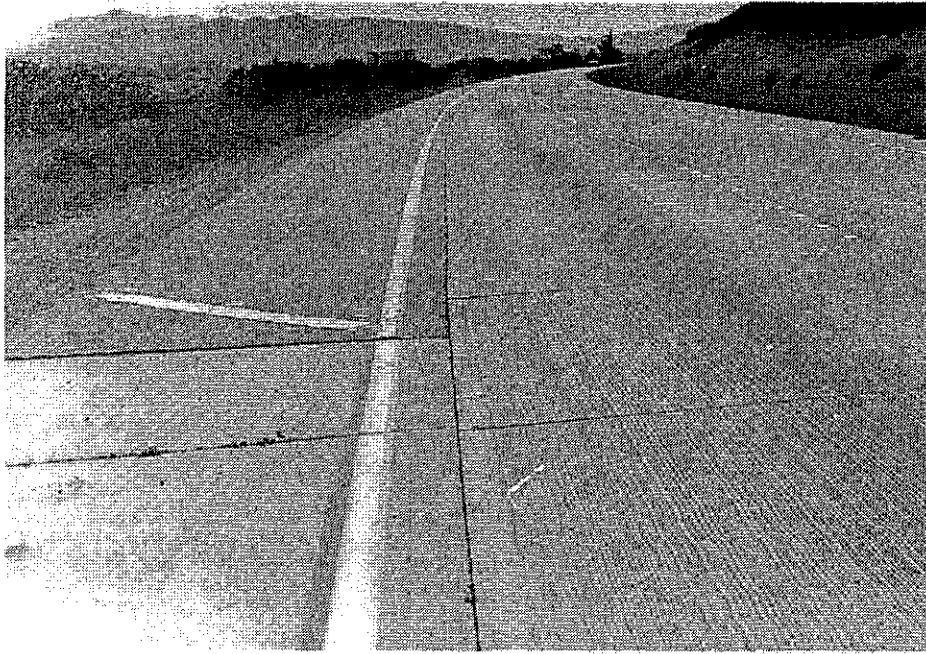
Beginning of Concrete Shoulder. No joint sealant, no tie bars.
